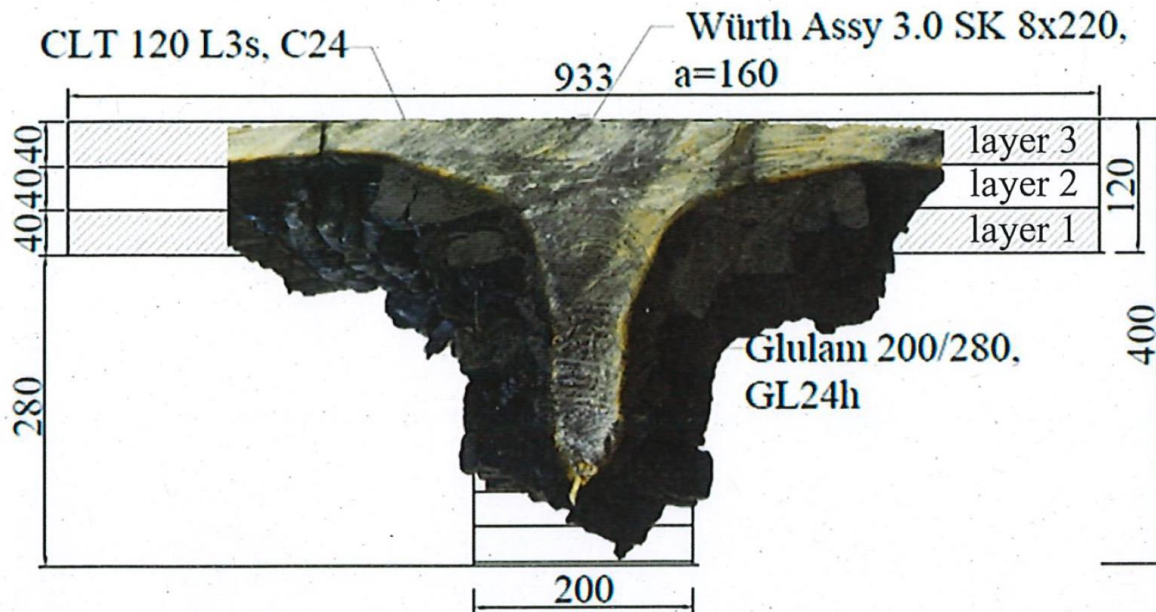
a: Fire test - Remaining cross-section of cross-section A after extinguishment of the test specimen (91+25) minutes
